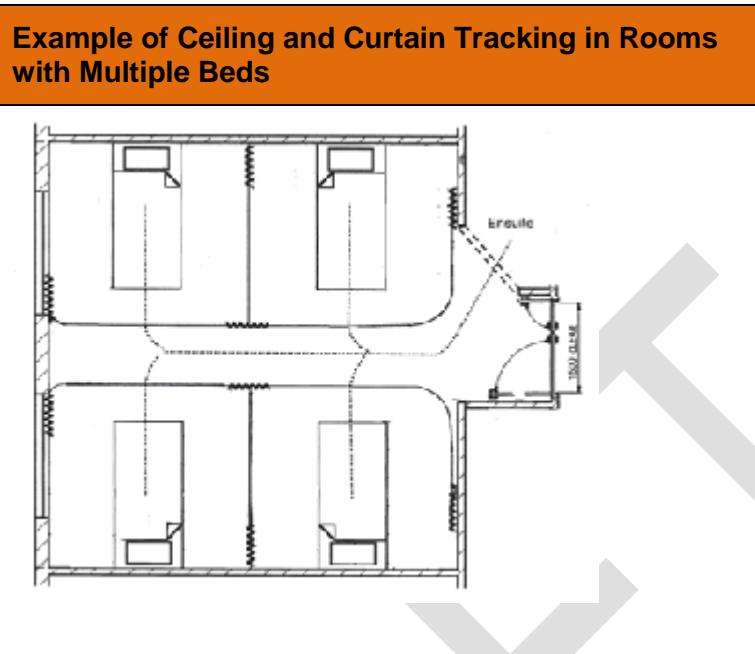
Example of Ceiling and Curtain Tracking in Rooms with Multiple Beds
